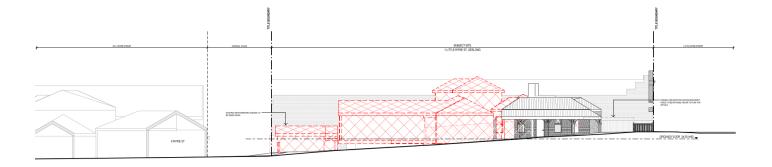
West elevation showing parts of the existing dwelling to be retained and demolished (Source: Cera Stribley Architects)
